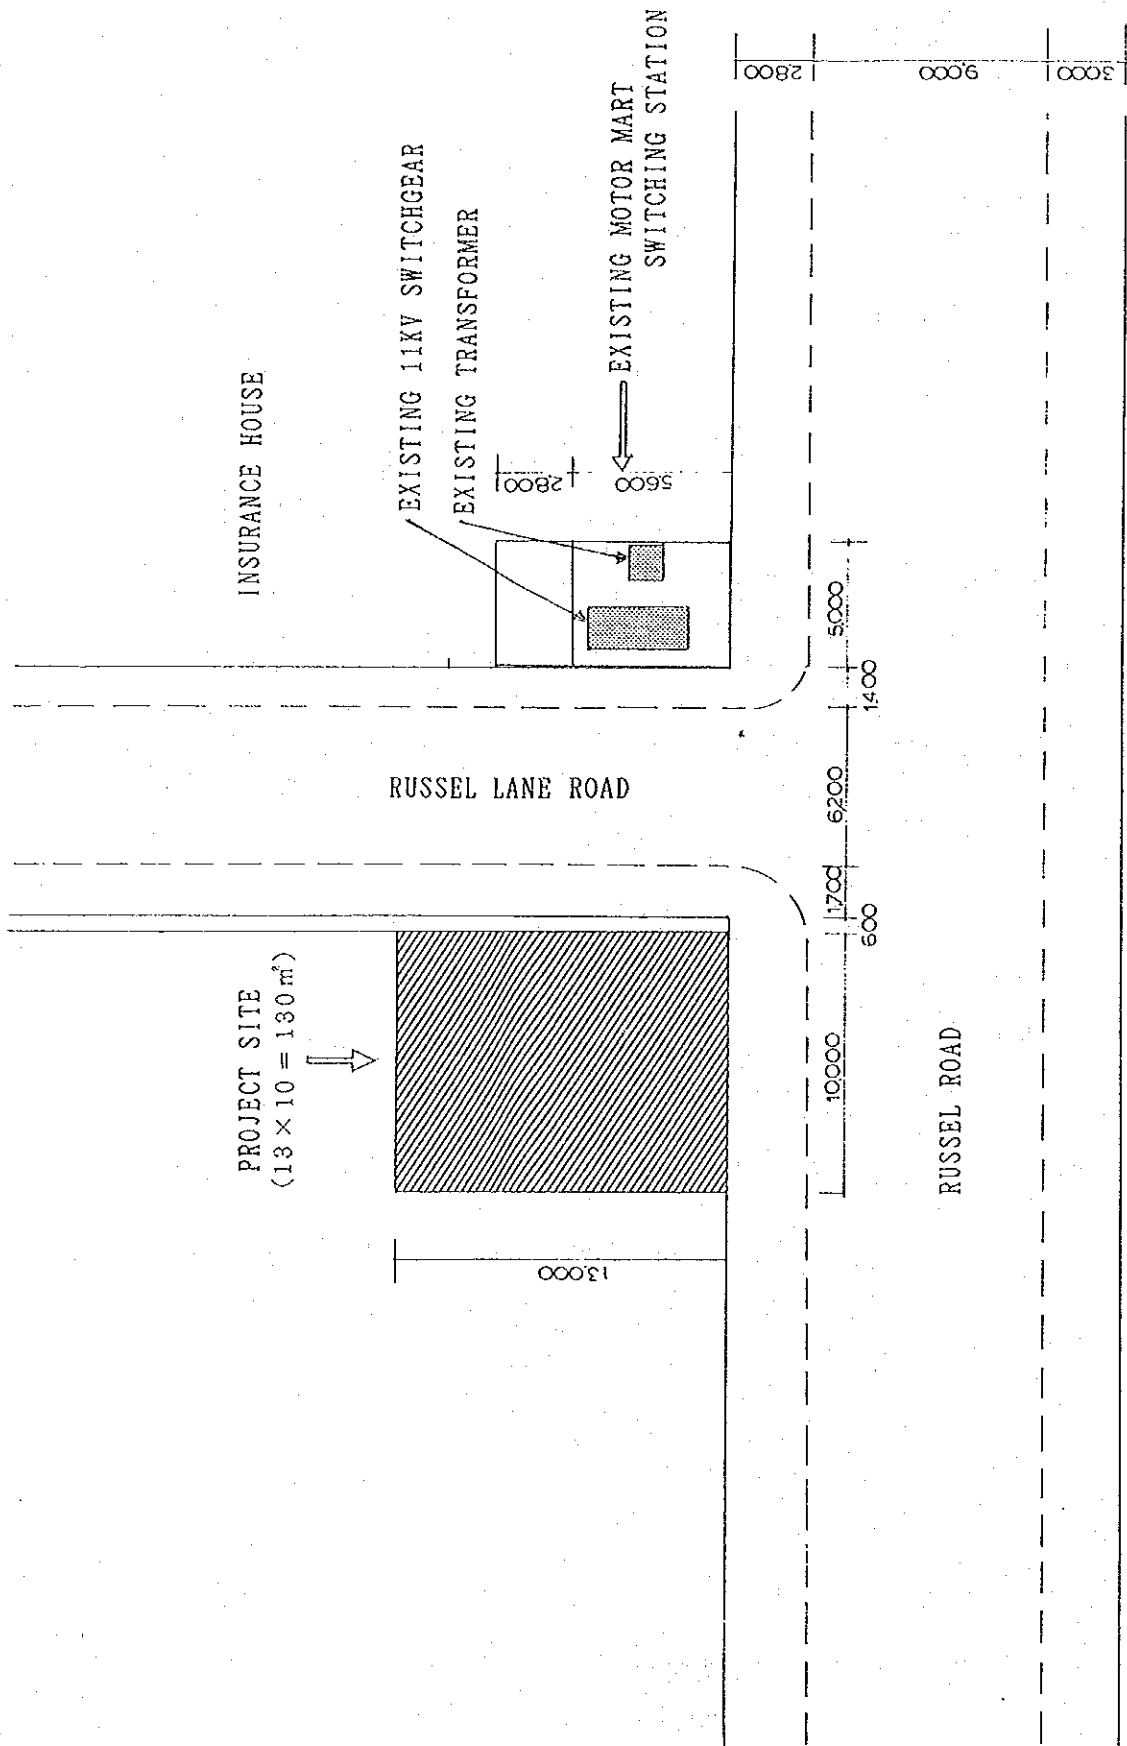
Layout of Existing Motor Mart Switching Station
